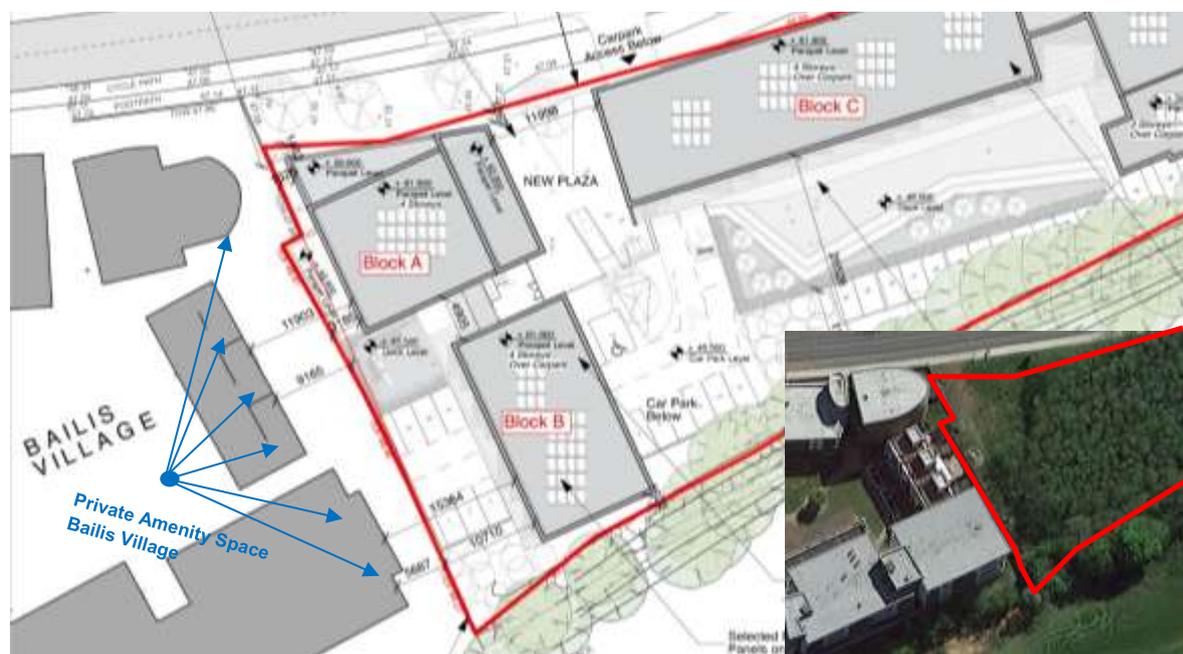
Extract of proposed site layout plan. Block A will be situated only 11 metres and Block B only 16 metres from the private amenity space of a number of units in Bailis Village and it is considered that the residential Blocks A and B will dominate Bailis Village resulting in overlooking and overbearing on the adjacent properties.
